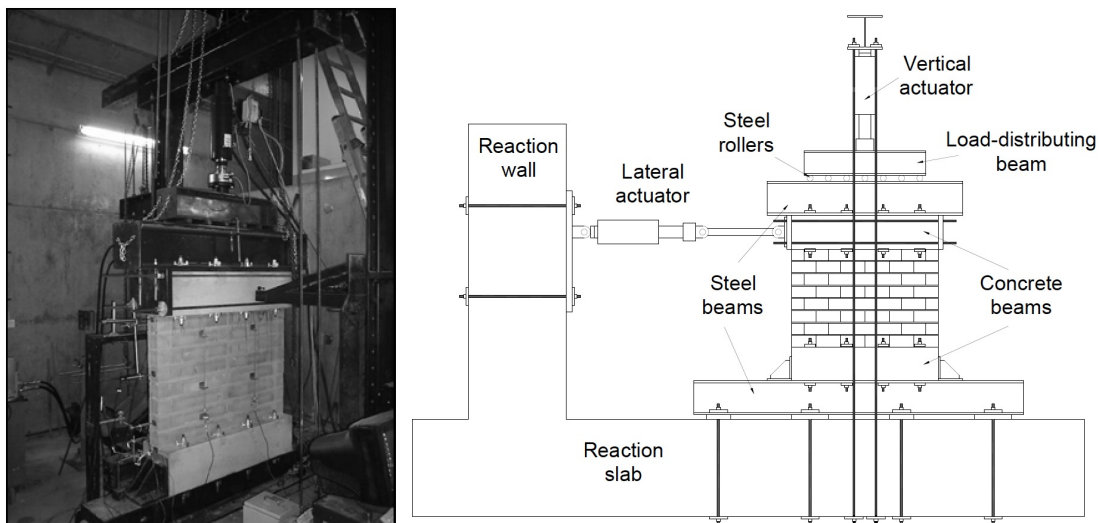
Set-up used for Reinforced Concrete Block Masonry Walls (Haach *et al.*, 2009)
